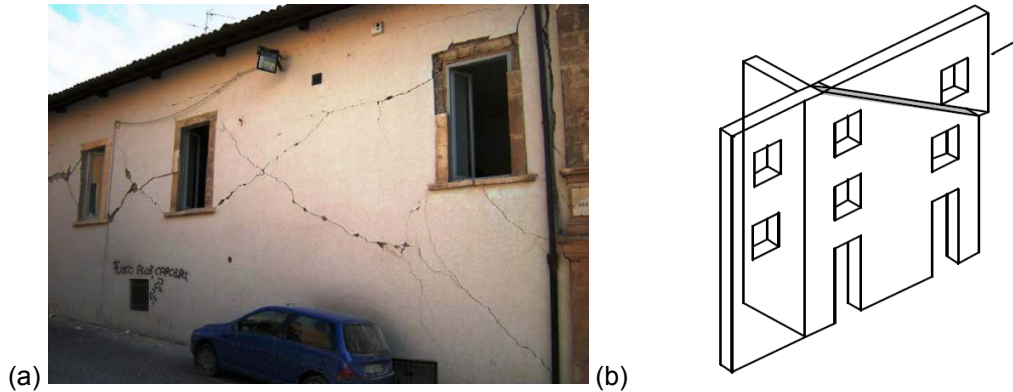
Examples of In-plane failure: (a) X pattern in a wall (Augenti and Parisi 2010) and (b) a triangular section of a wall.
